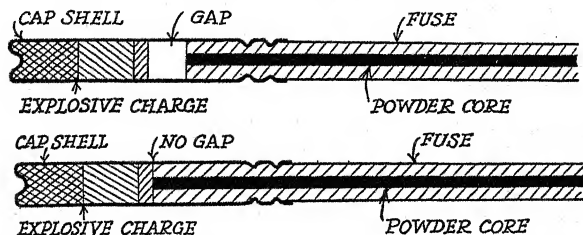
(top) Fuse inserted in blasting cap improperly, showing gap, and (bottom) properly seated on explosive charge
